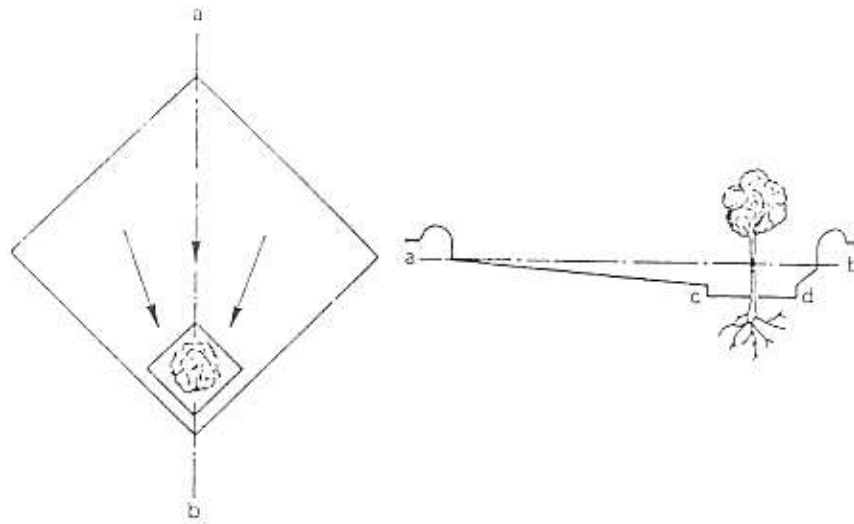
Plan and Cross Section of a Micro Catchment.
